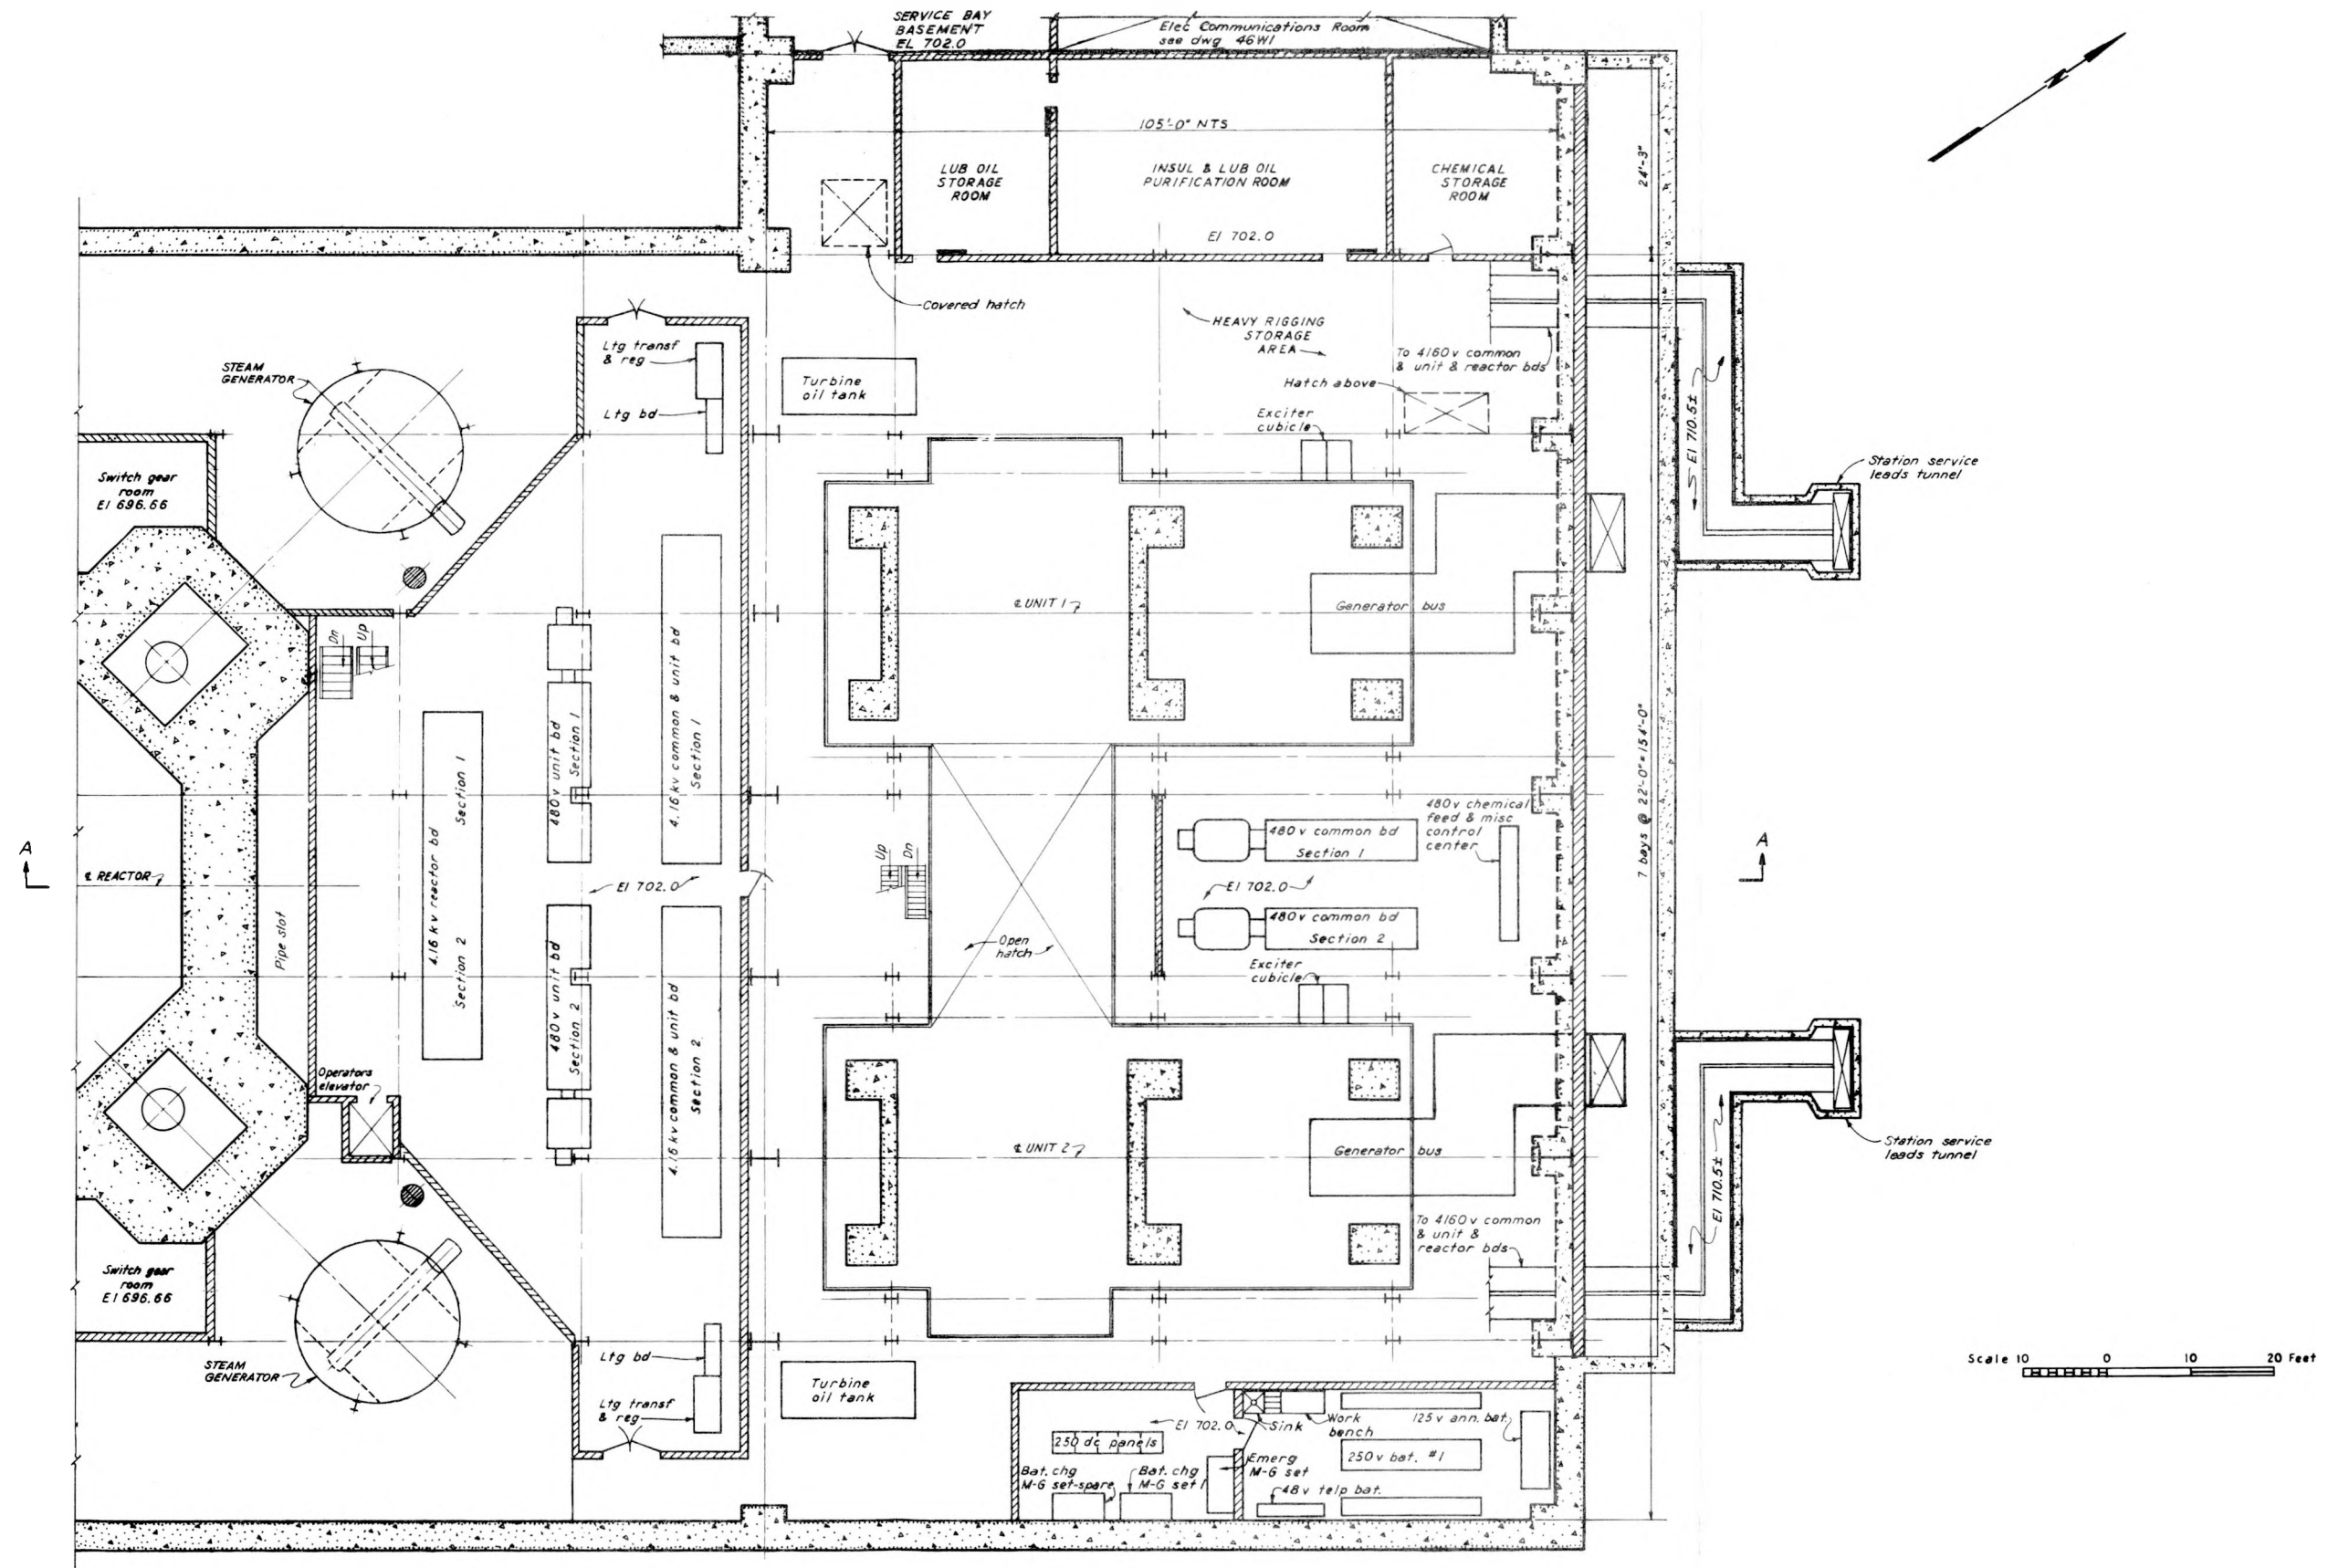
Equipment Layout at Elevation 702.0 (ORNL - GCR-2) (Design Div., Tennessee Valley Authority).
